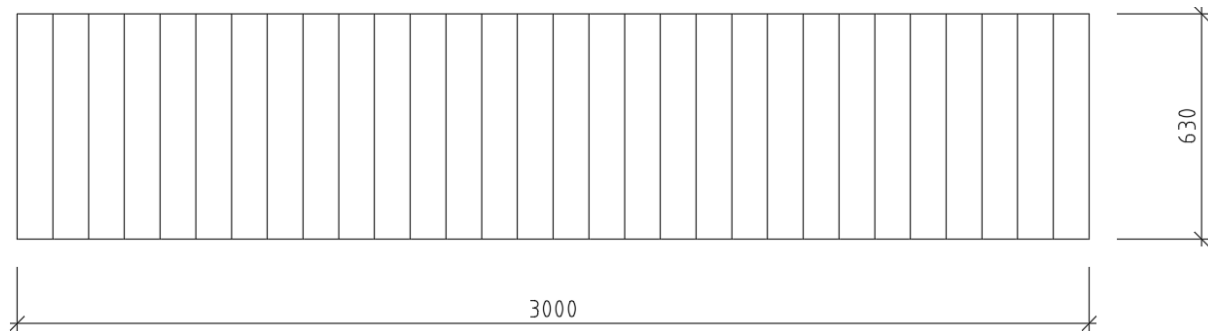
Cross section of the timber bridge, measurements in mm.
